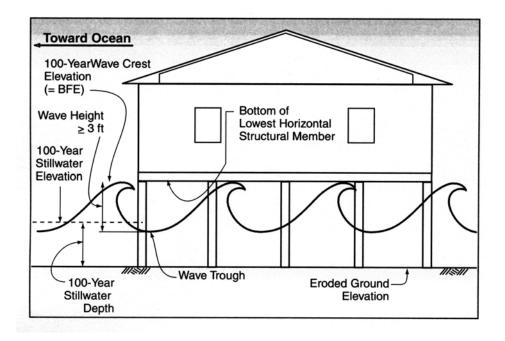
Minimum NFIP standards applied to New Jersey coastal dwellings in the Vzone require that buildings be elevated on an open foundation so that the lowest horizontal structural member is above the Base Flood Elevation. Reprinted with permission from the FEMA Coastal Construction Manual (FEMA, 2000).
